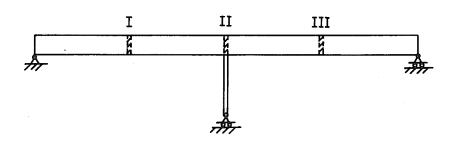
BOX-GIRDER BRIDGE WITH TWO INTERIOR DIAPHRAGMS, I AND III, AND ONE SUPPORT BENT, II
